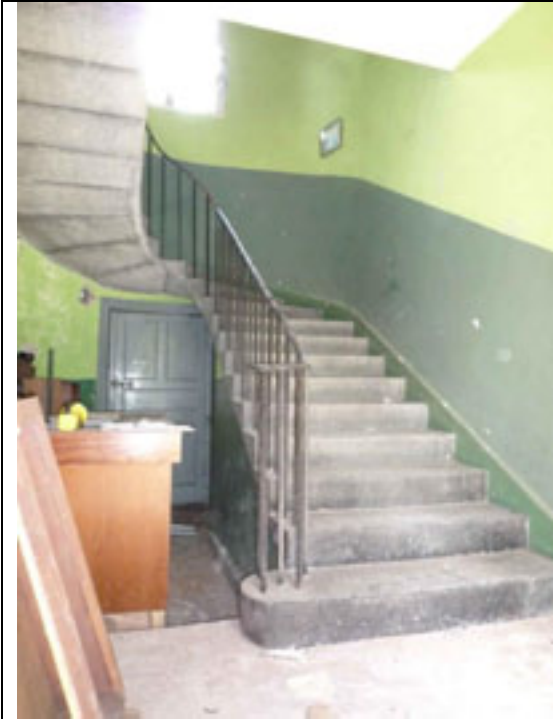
Cantilevered staircase rising from ground to first floor. Note the apsidal end to this room.
